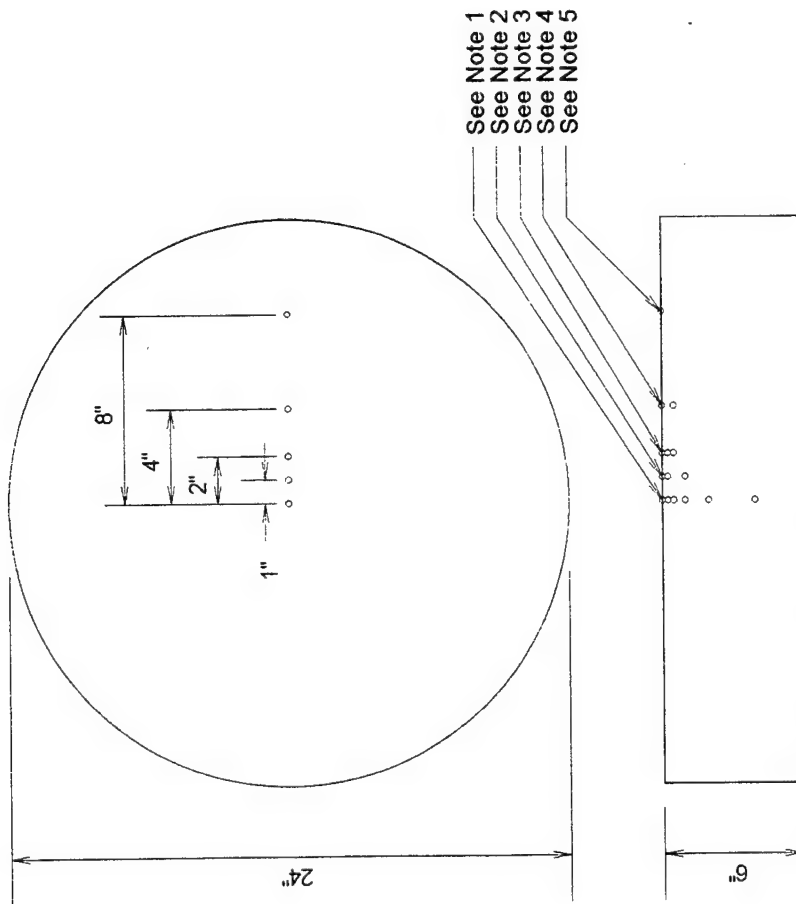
Design of instrumented concrete specimens to measure temperature distributions resulting from impingement of the jet flow on the concrete
